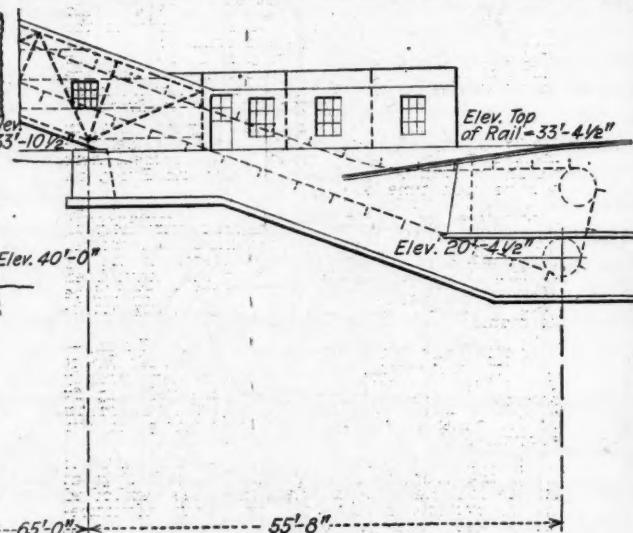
NEW ELEVATOR BRINGING COAL TO THE BREAKER
